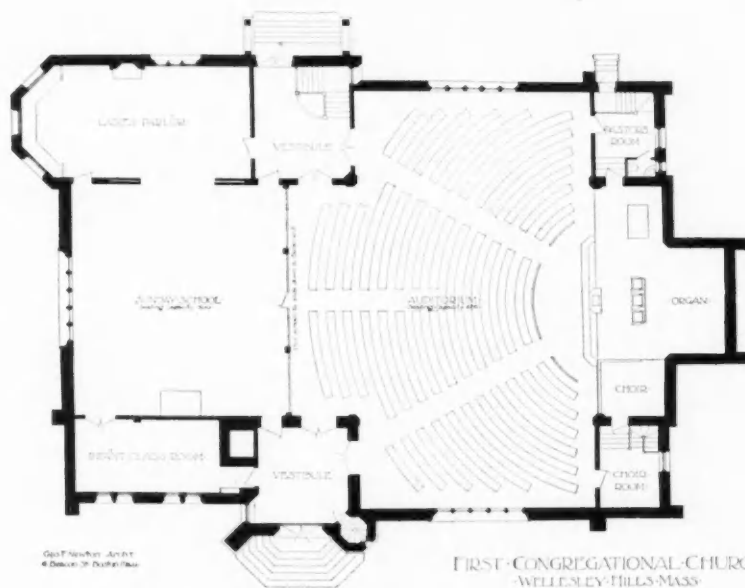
FIRST CONGREGATIONAL CHURCH, WELLESLEY HILLS, MASS. GREEK CROSS PLAN AUDIENCE HALL.
